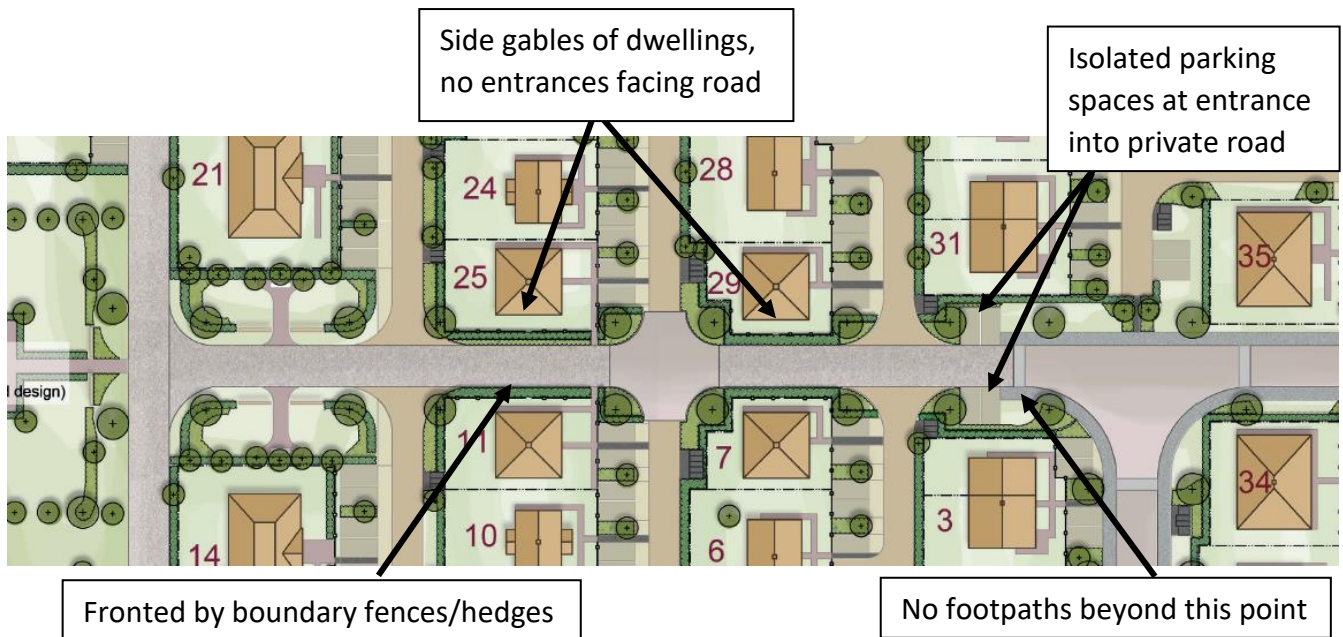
Extract from Site Layout Plan showing treatment along secondary route
